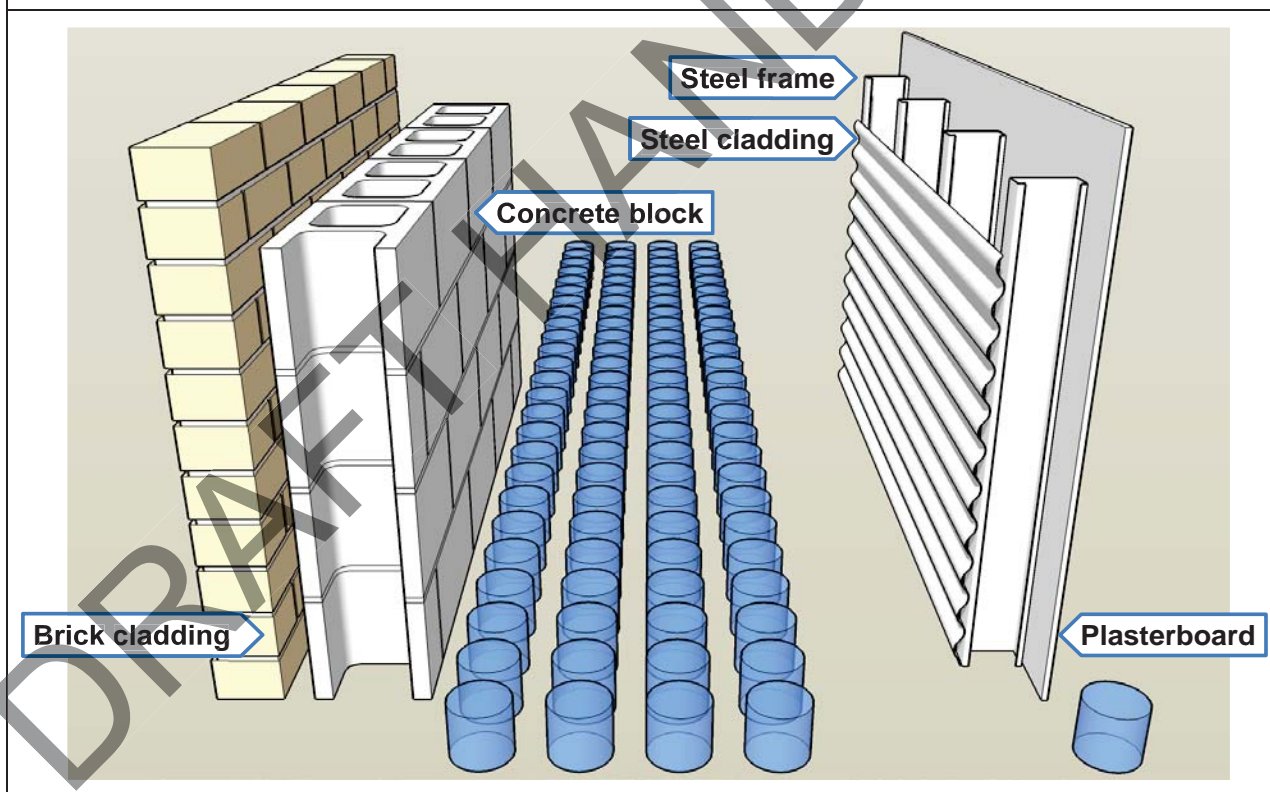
Storage capacity of materials in the external walls of a 185 m² brick veneer house
